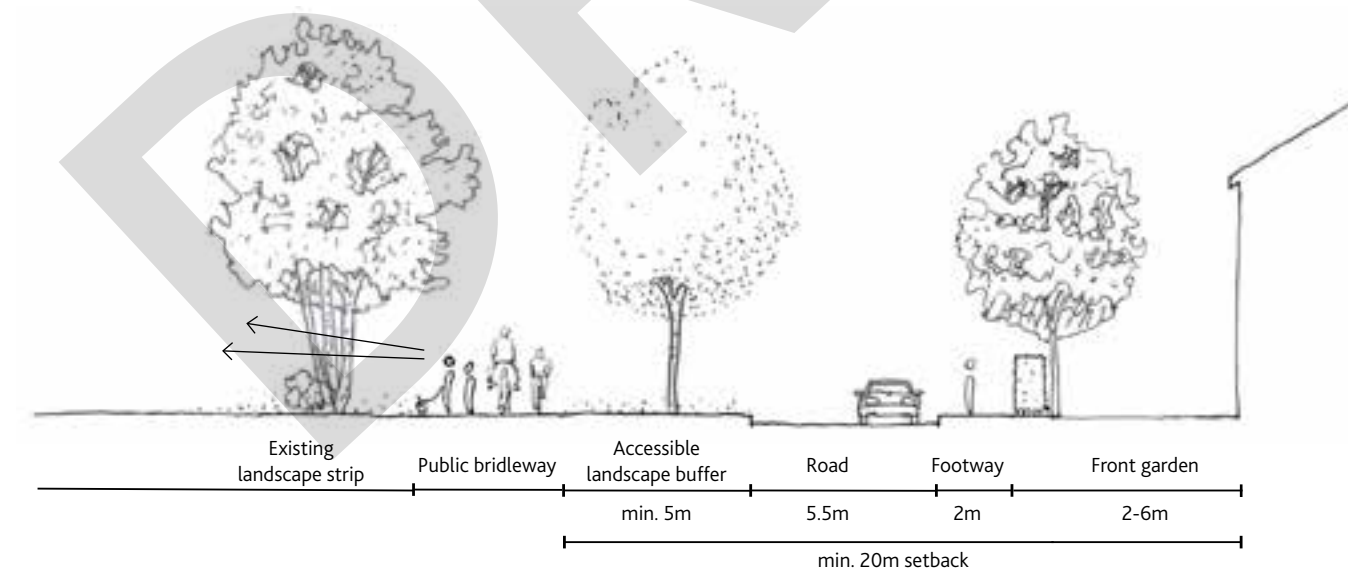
Typical street section 11 - typical street section in Rural Fringe area.
